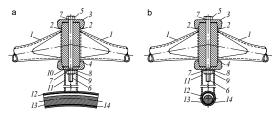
(a) and (b) are sections of the developed joint of the reinforced cylindrical grid shell: 1 - tubular rods, 2 - wedge-shaped tips, 3 - upper nodal disc, 4 - lower nodal disc, 5 tightening bolt, 6 - thread, 7 - hole in the discs, 8 - shim, 9 - screw nut, 10 - a drip for draining water, 11 - cylindrical shell, 12 - curved tubular rod, 13 - diaphragm, 14 - a lining material
